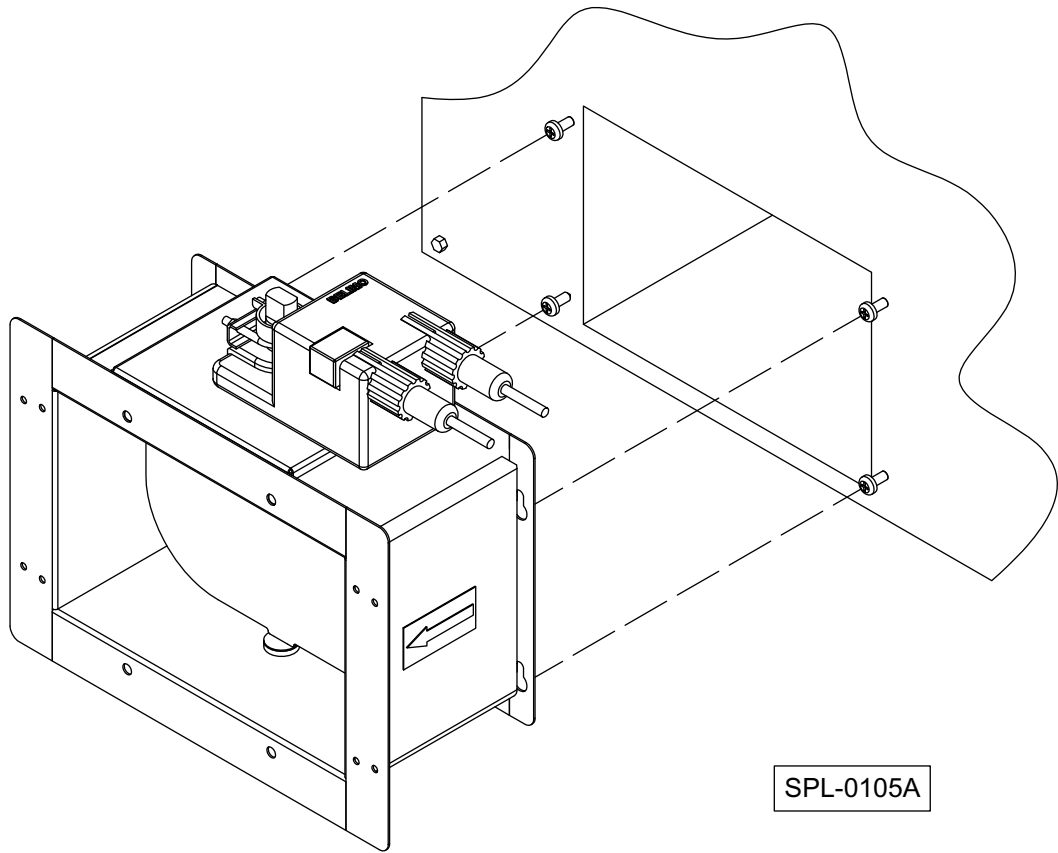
ACM ATTACHMENT TO AIR HANDLER
